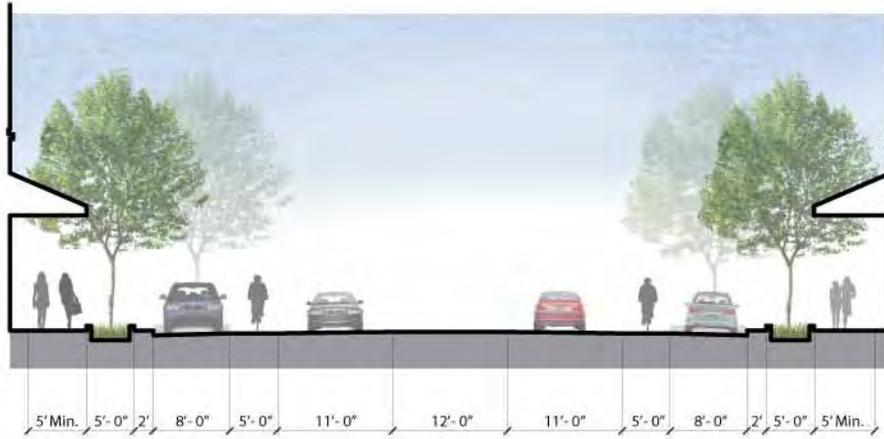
Typical MD 725/Marlboro Pike Street Section with Turn Lane and Plan
